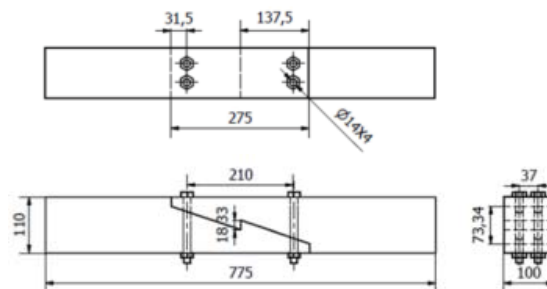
Design of Hook Oblique Lip Joint with Bolt (B4)
